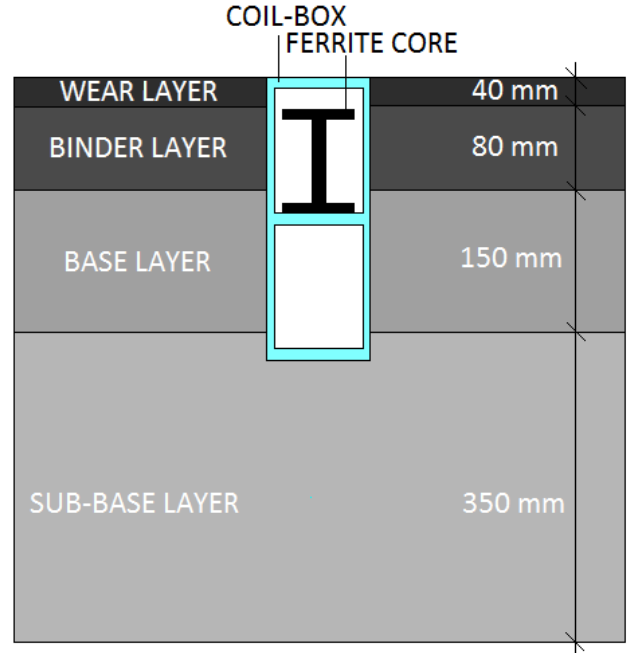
E-road pavement structure with layers and the charging unit installed in the middle of road lane.
